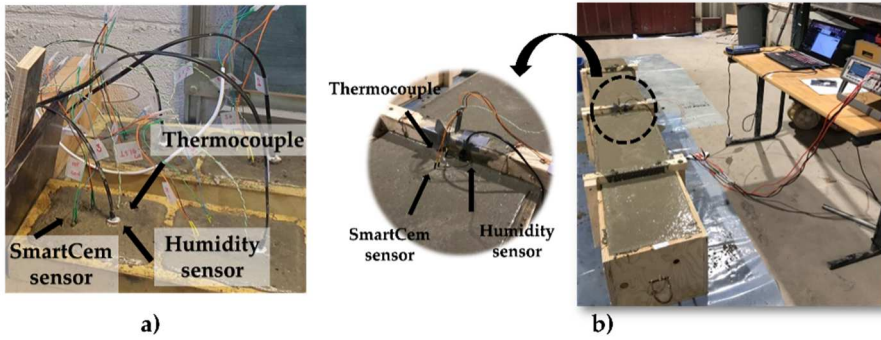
Arrangement of embedded sensors for hydration monitoring of a) the NC and b) the SCC beam.
